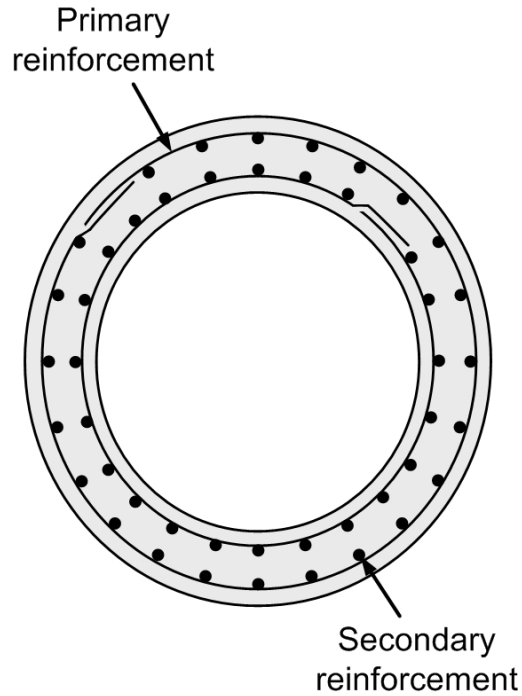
Steel Reinforcement in a Concrete Pipe Culvert
